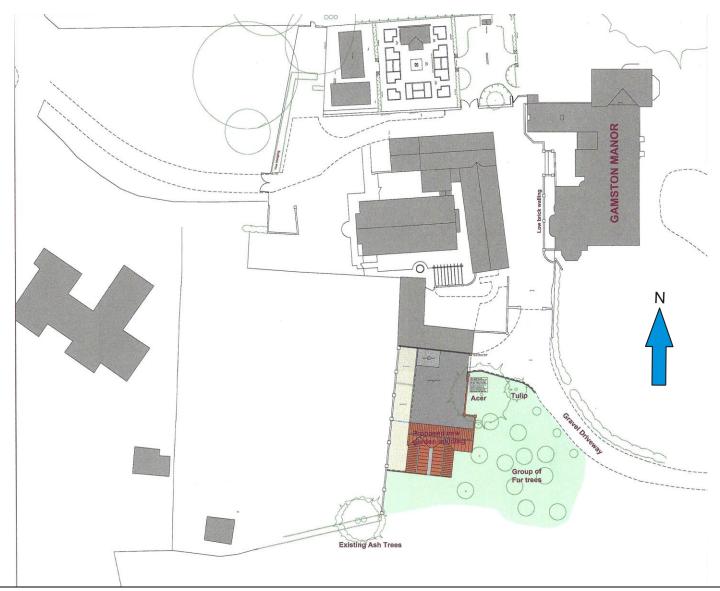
Plan showing the proposed layout of the proposed development site at an original scale of 1:200 at A1, (extract from Architects plan).
